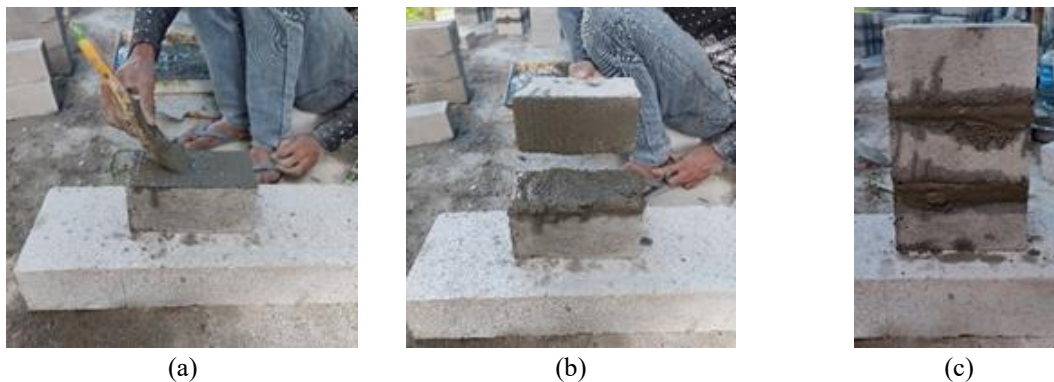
Casting of prism specimen (a) Cement slurry application, (b) Binding mortar application and (c) Casted specimen
